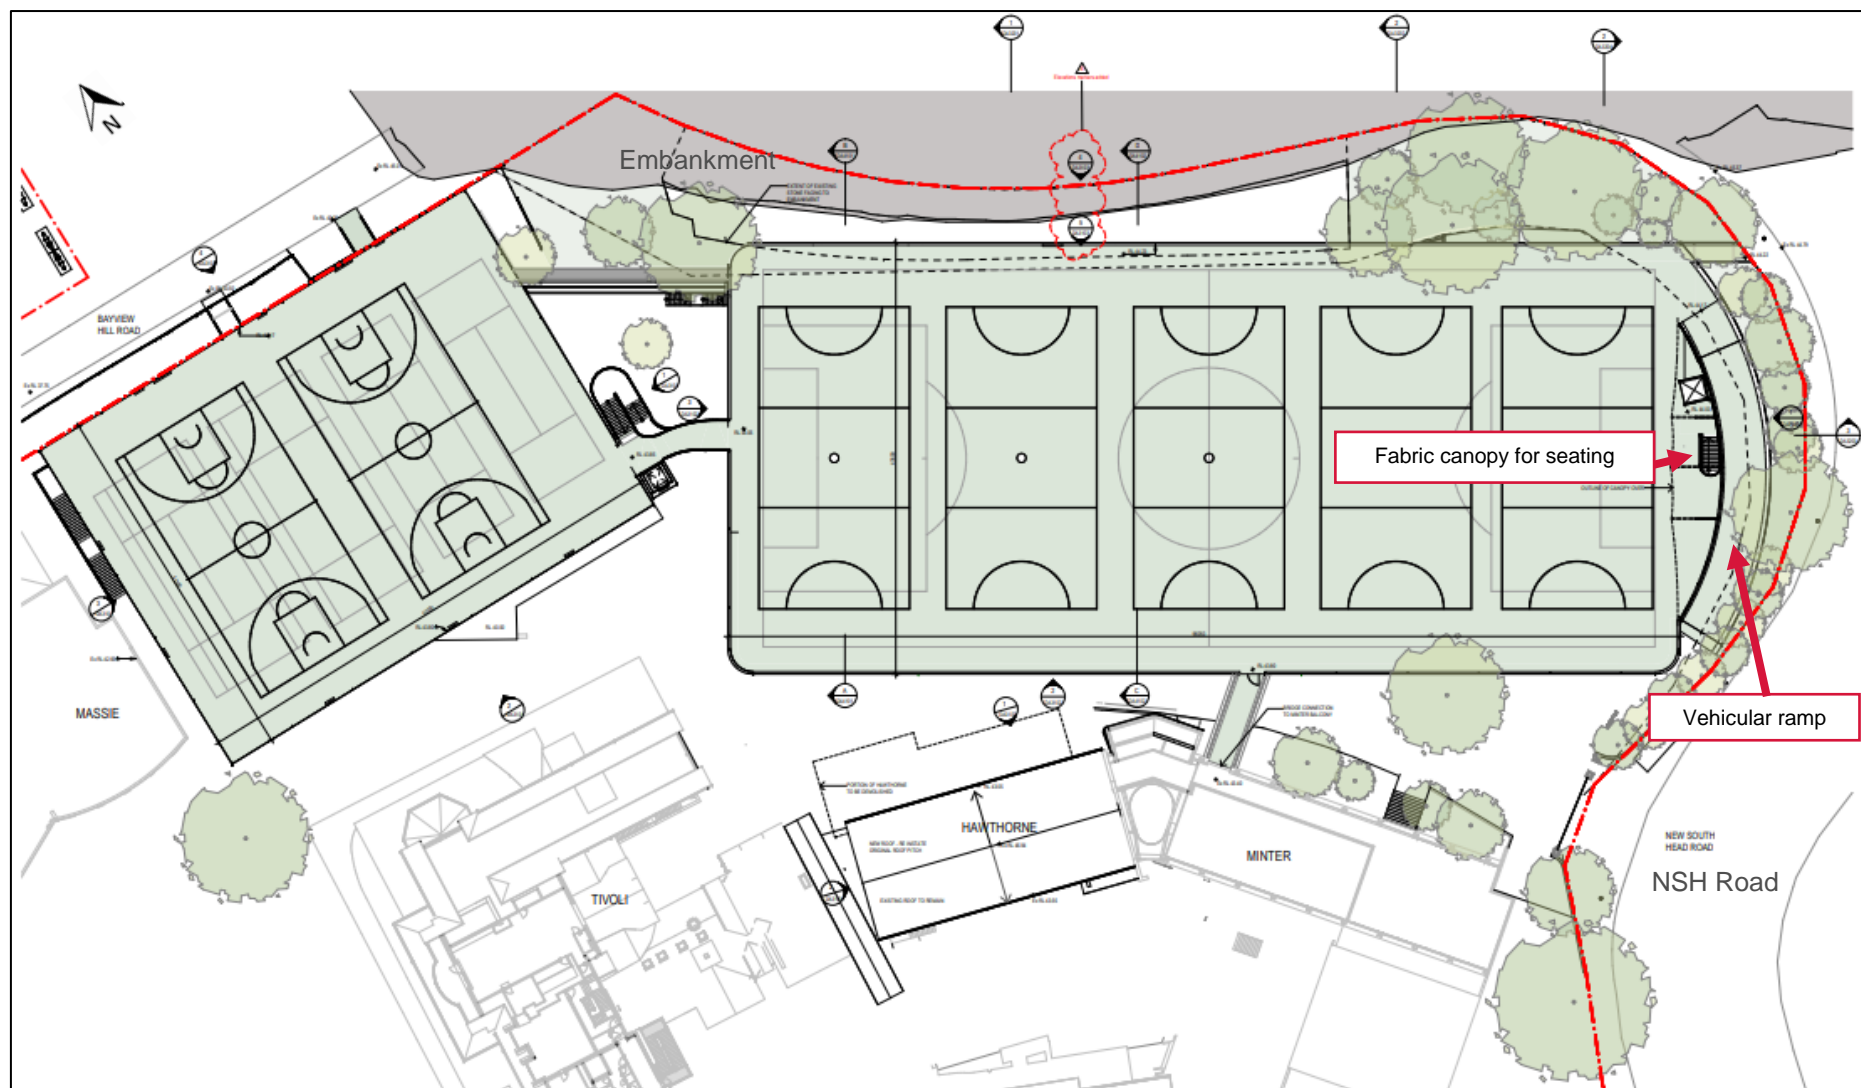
| Ground floor layout (Source: Applicant's RtS 2021)
